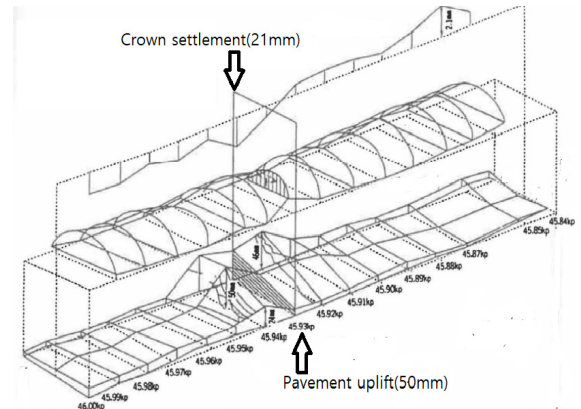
Asamayama tunnel (Pavement uplift, Crown settlement)
